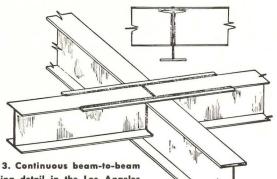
Continuous beam-to-beam framing detail in the Los Angeles Telephone Building. Top flanges of beam extend across top flange of girder and are butt welded together on center line of girder.
